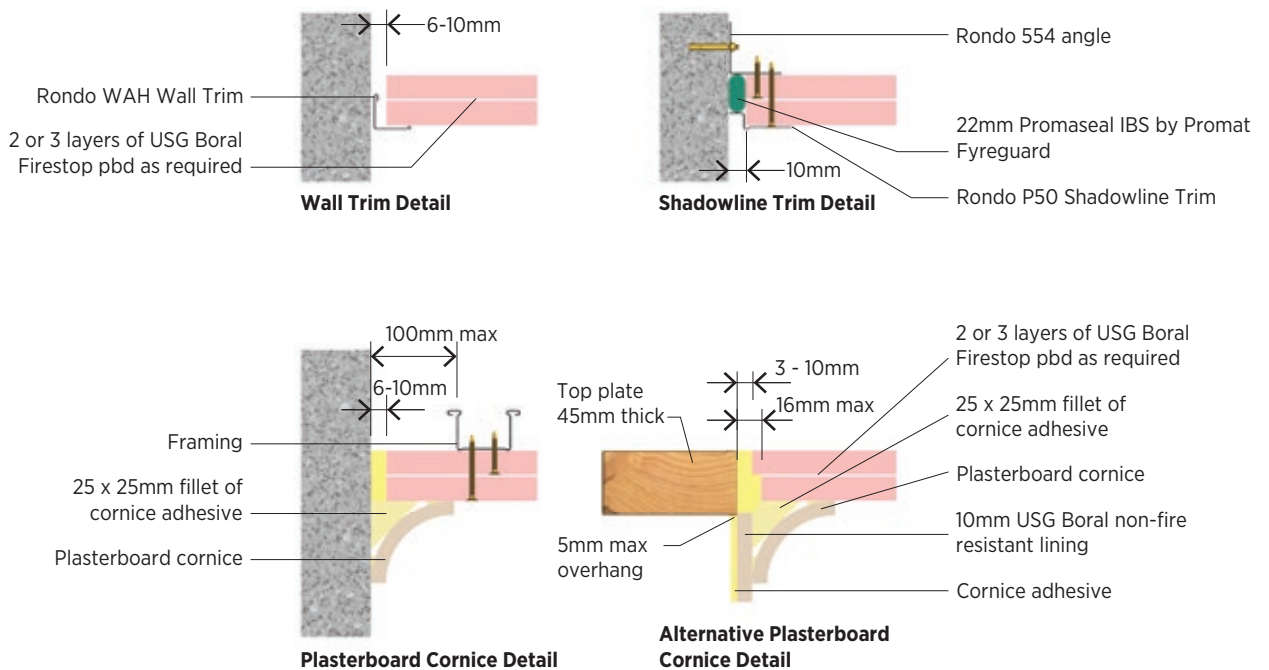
Typical Perimeter Detail - FRR 60/60/60
